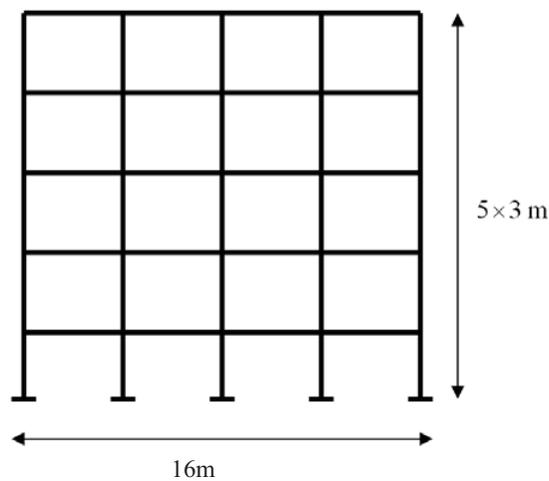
Vertical elevation of the five-storey reinforced concrete structure in the seismic direction
